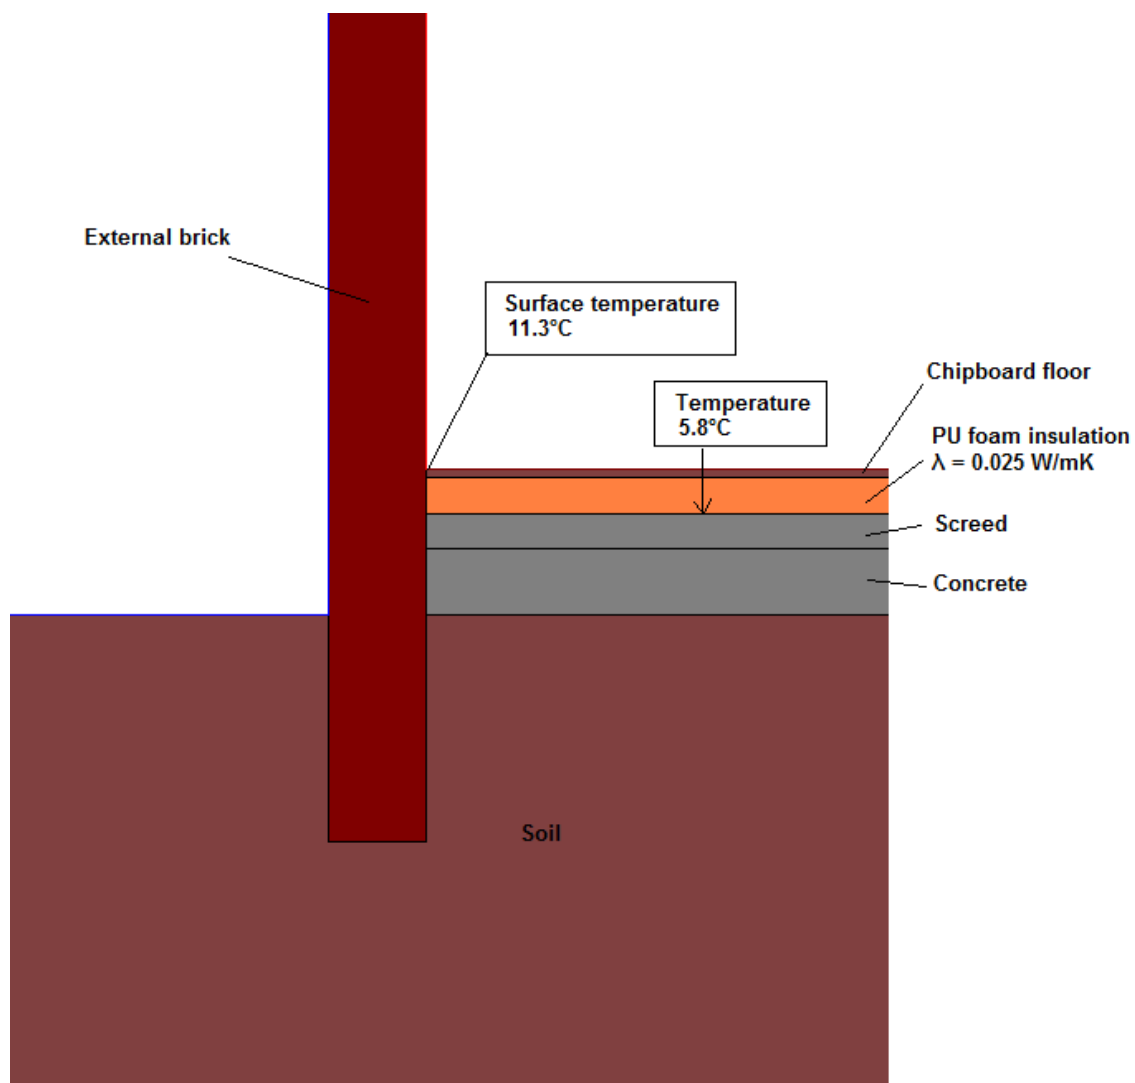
Junction between floor type R2 and an uninsulated solid wall
